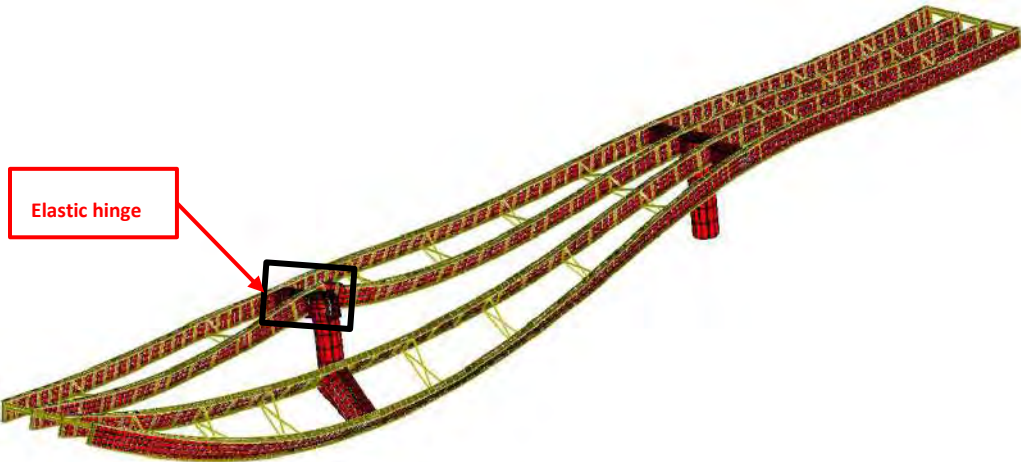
Deformed Shape After Forming Elastic Hinge on Girder B at 0.25xHL93
